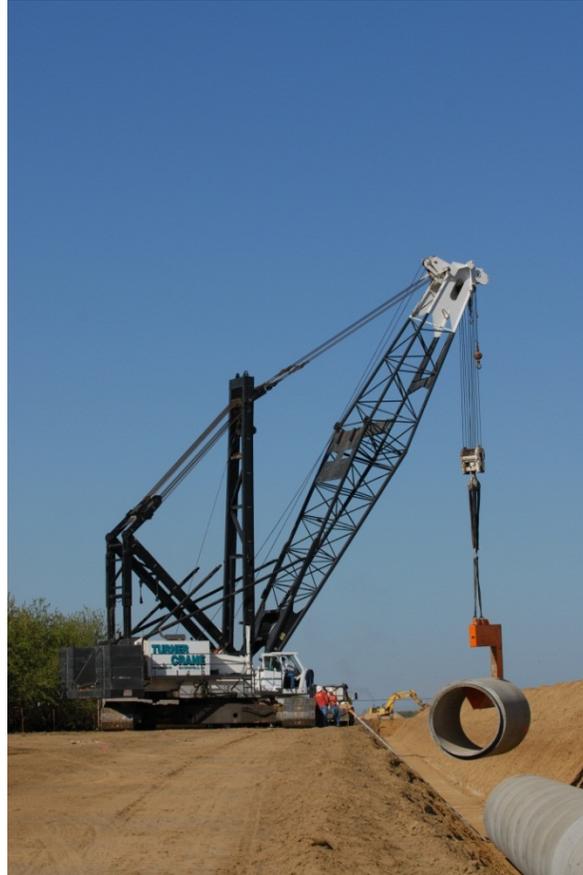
Installation of 120-inch dia. pipeline connecting the Aqueduct with the Pond-Poso Canal
